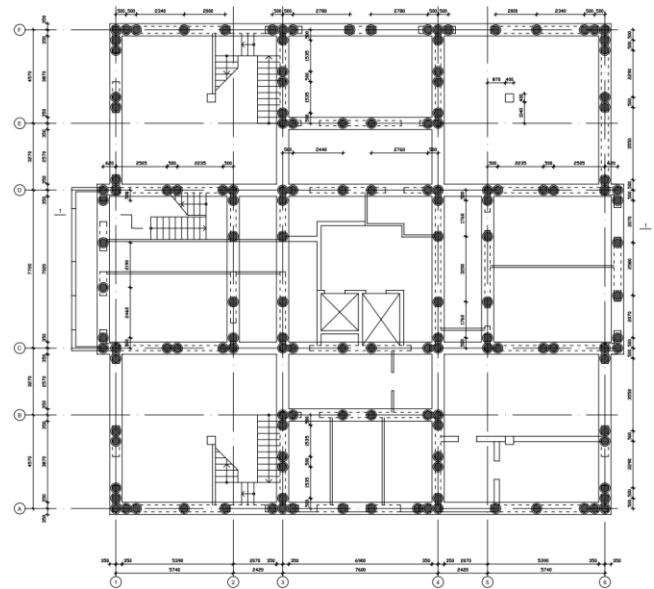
Plan of the basement floor at the mark -3.70 where the base isolation interface is designed between the marks -0.30 and -1.30
